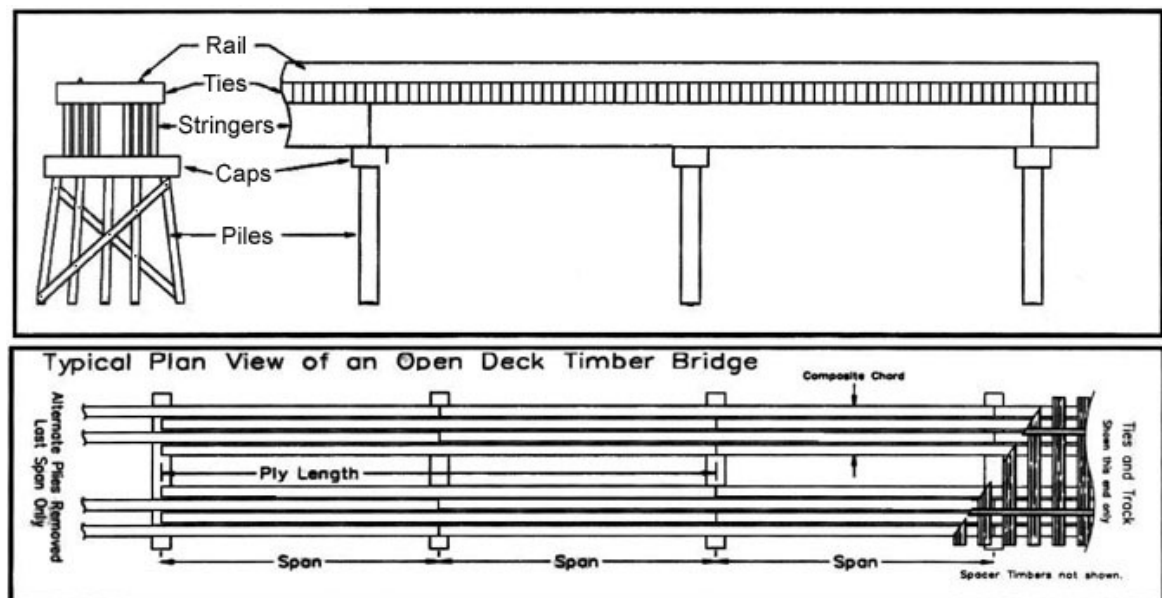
Schematic of a standard open-deck timber trestle railroad bridge
